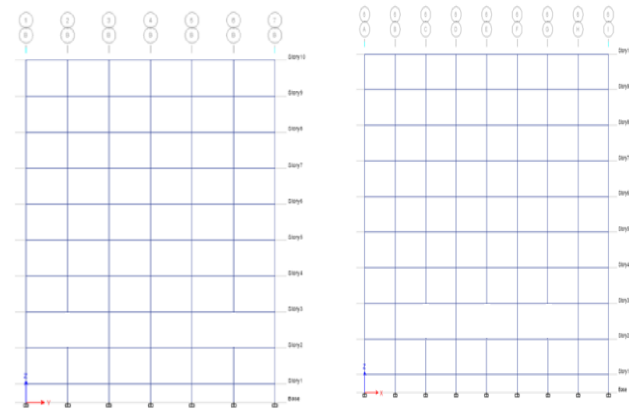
Elevation of FCC 1F Fig. 3.7 Elevation of FCLSA 1F
